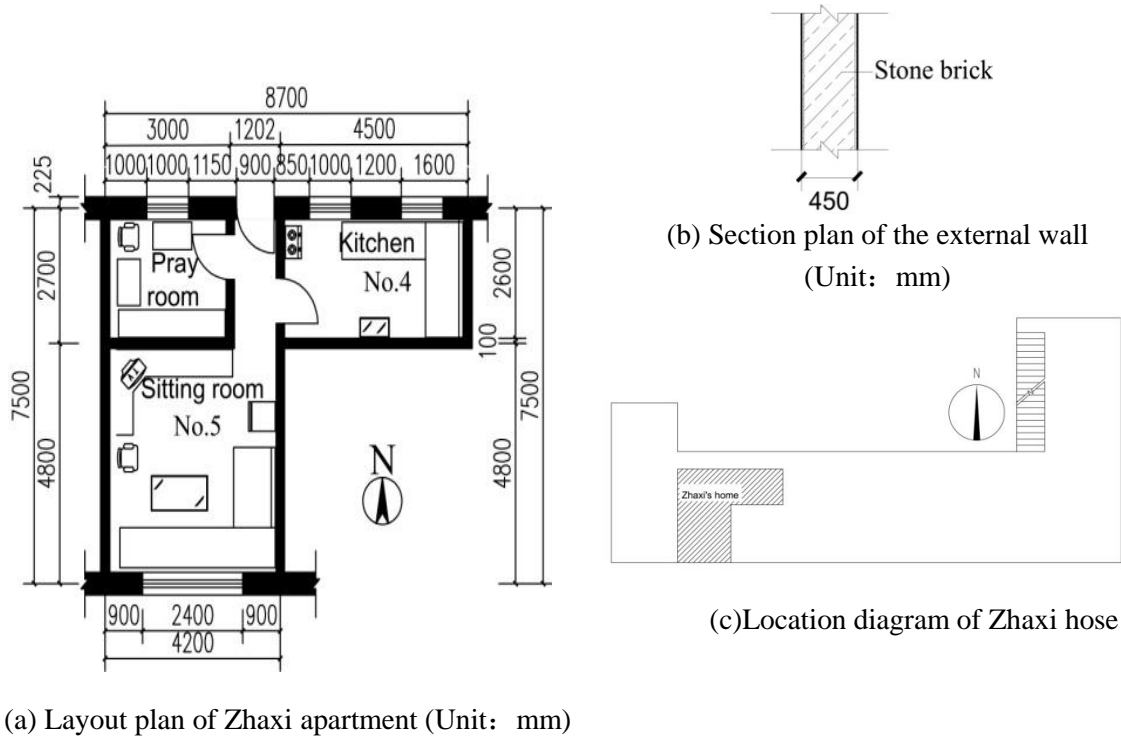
The layout plan, external wall section plan and location diagram of Zhaxi house
